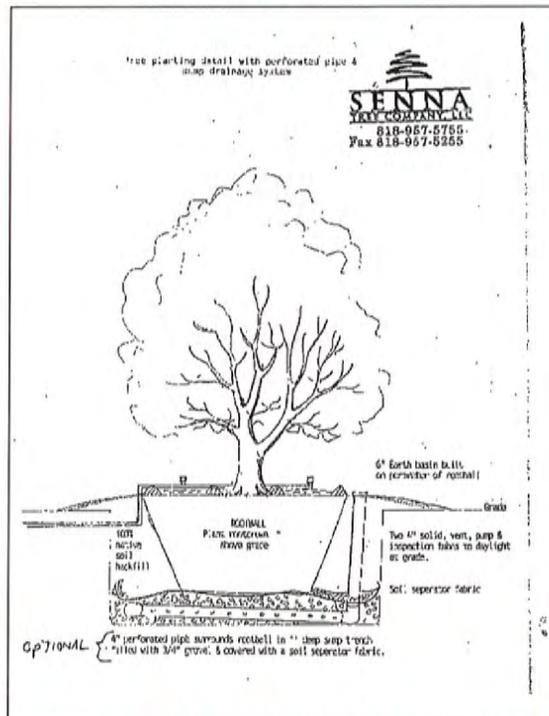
Tree planting detail showing the layout for the perforated pipe, gravel, filter fabric.
